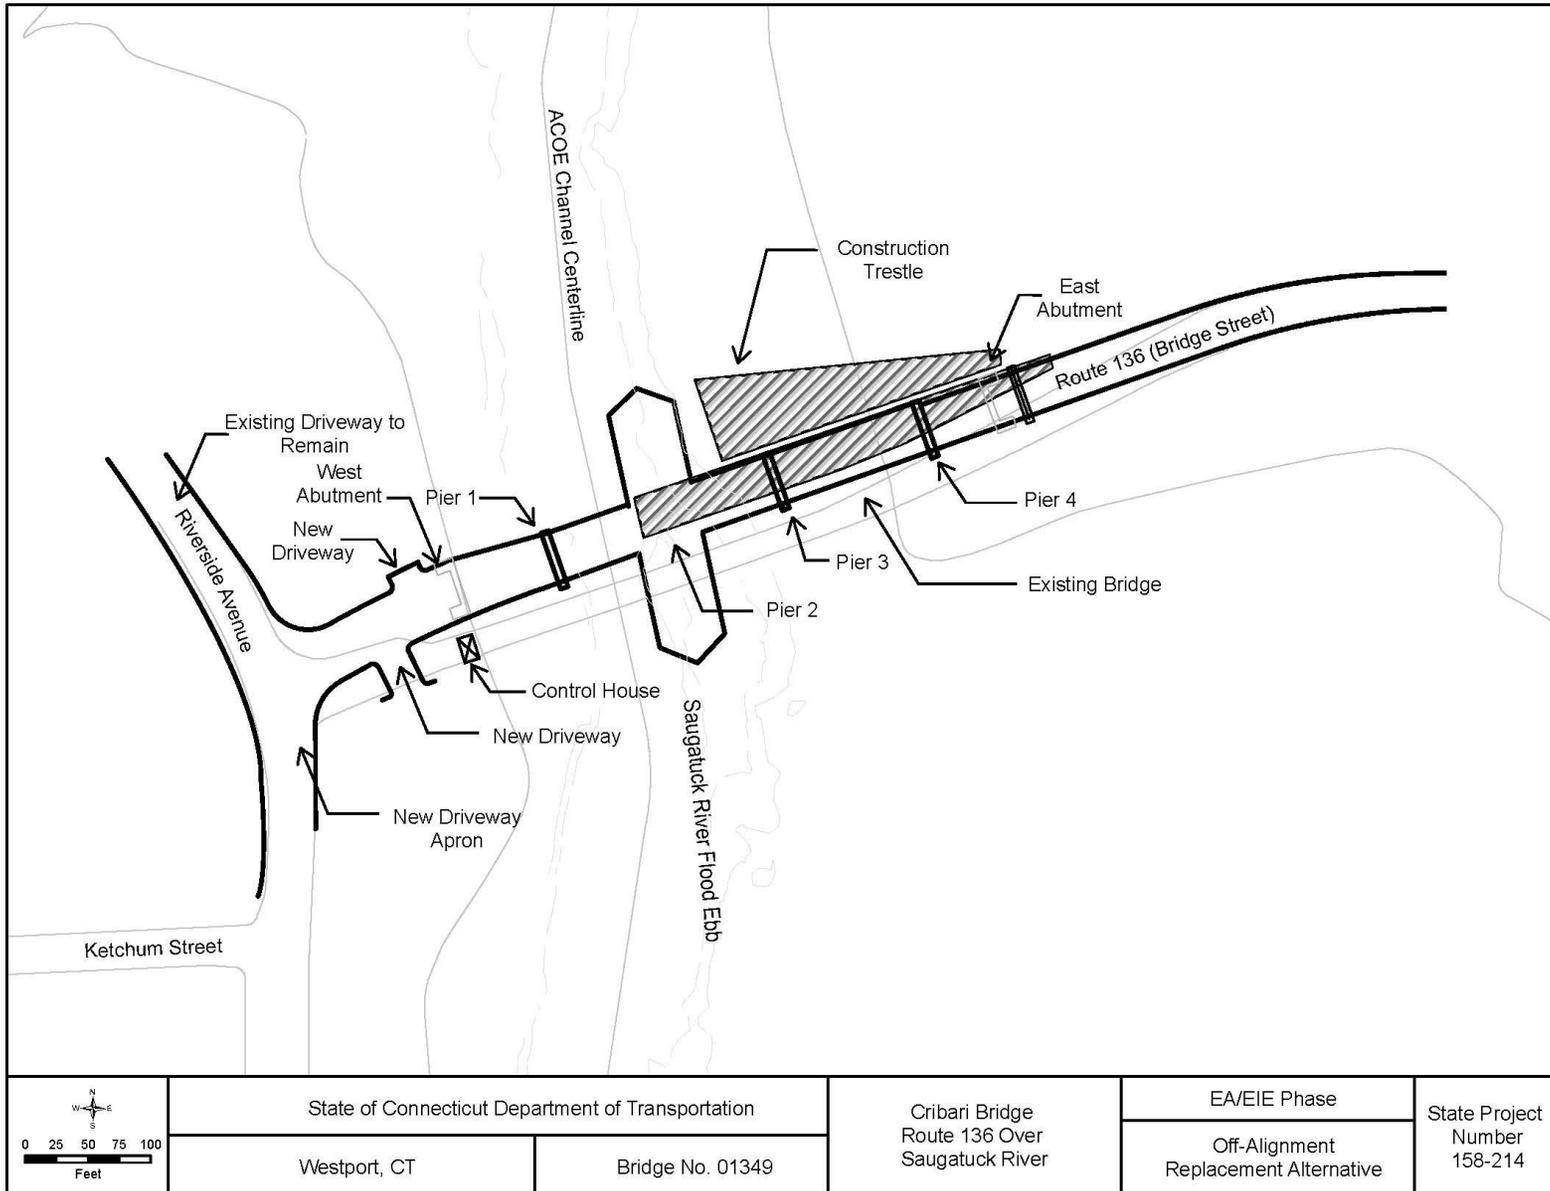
Conceptual Plan for the Off-Alignment Bridge Replacement Alternative
